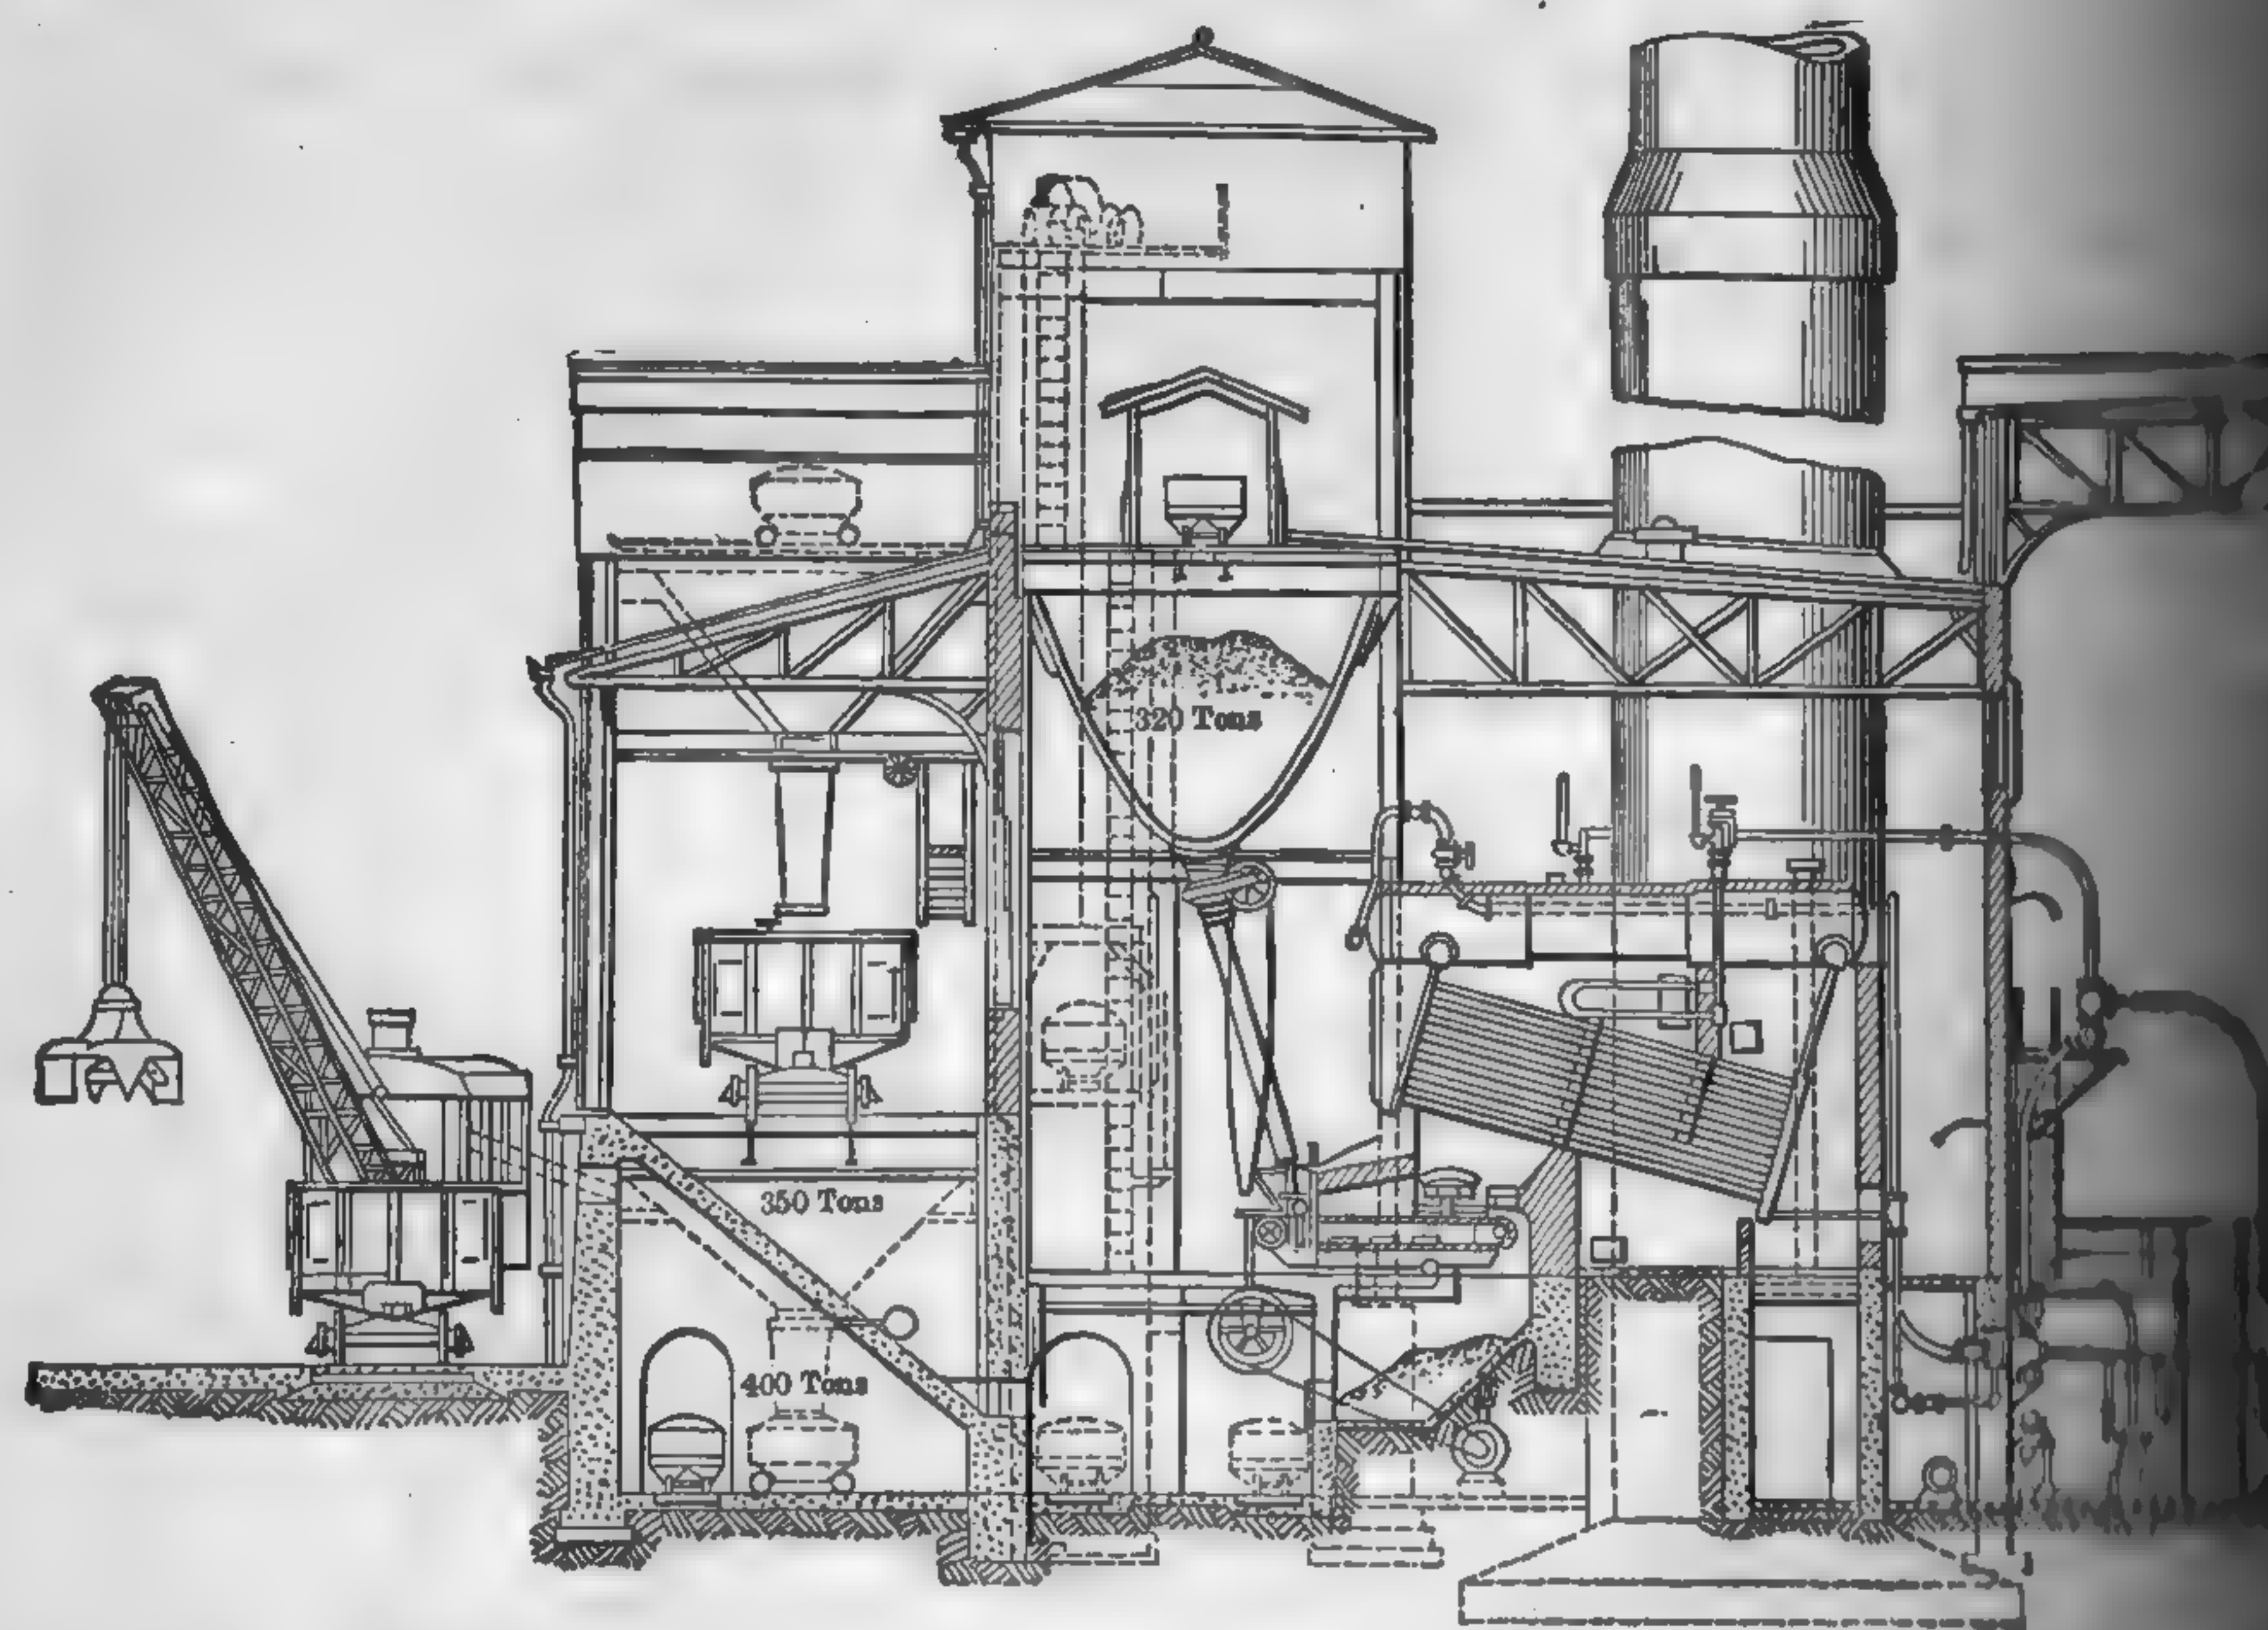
Typical Installation — Portable Crane. Grab Bucket and Bucket Conveyor.
